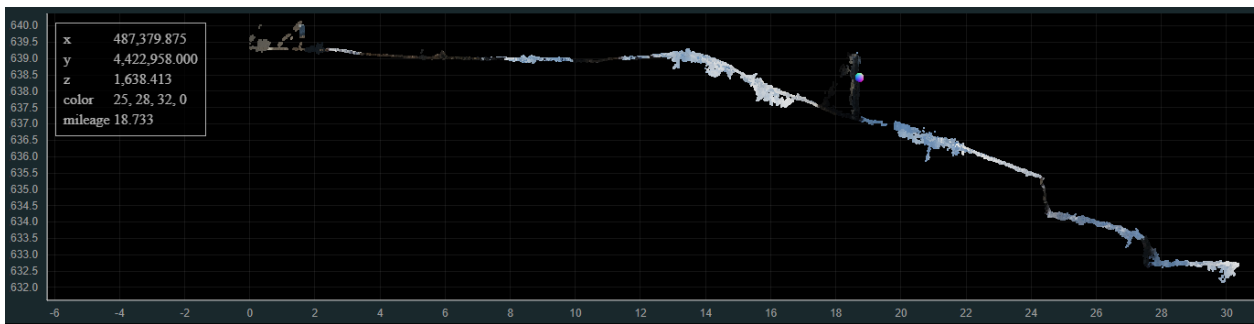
shows Profile A shows an elevation view of the retaining wall along Wall A while Figure 6-11 shows profiles along Wall B-D. Of particular note is a the storm sewer along the top tier of Wall B-D, a manhole of which is show at a purple indicator in Figure 6-11c, which is located approximately 30 ft from the top of the wall. This buried infrastructure could be damaged if the slope were to become unstable. Wall stability is aided at this presents of trees, and their roots, positioned along the top of the wall (Figure 6-9b). While some trees were lost due to burn damage, survival of the remaining trees may impact wall stability over time.
